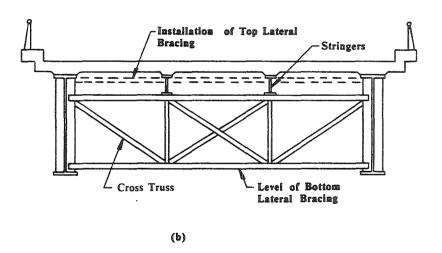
Typical Deck Type Two-Girder Bridge Cross Sections
